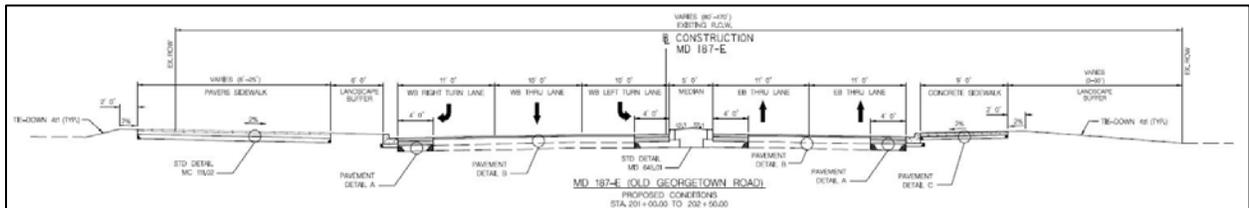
Proposed Phase 2 Cross Section – Old Georgetown Road just east of Rockville Pike (Looking East)
